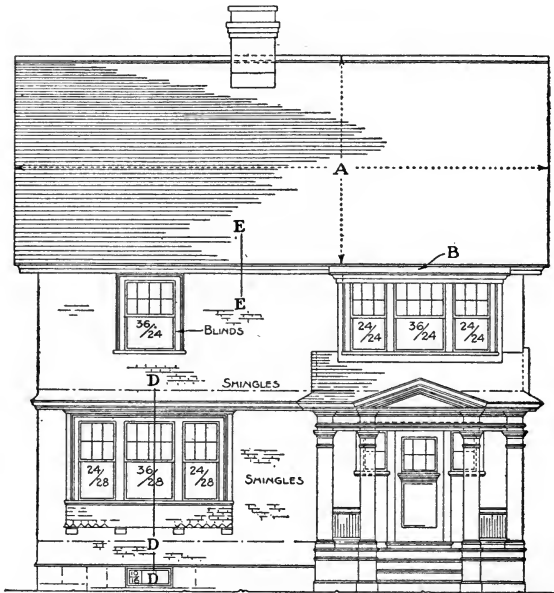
FRONT ELEVATION—SCALE  $\frac{1}{12}$  IN. TO THE FOOT
